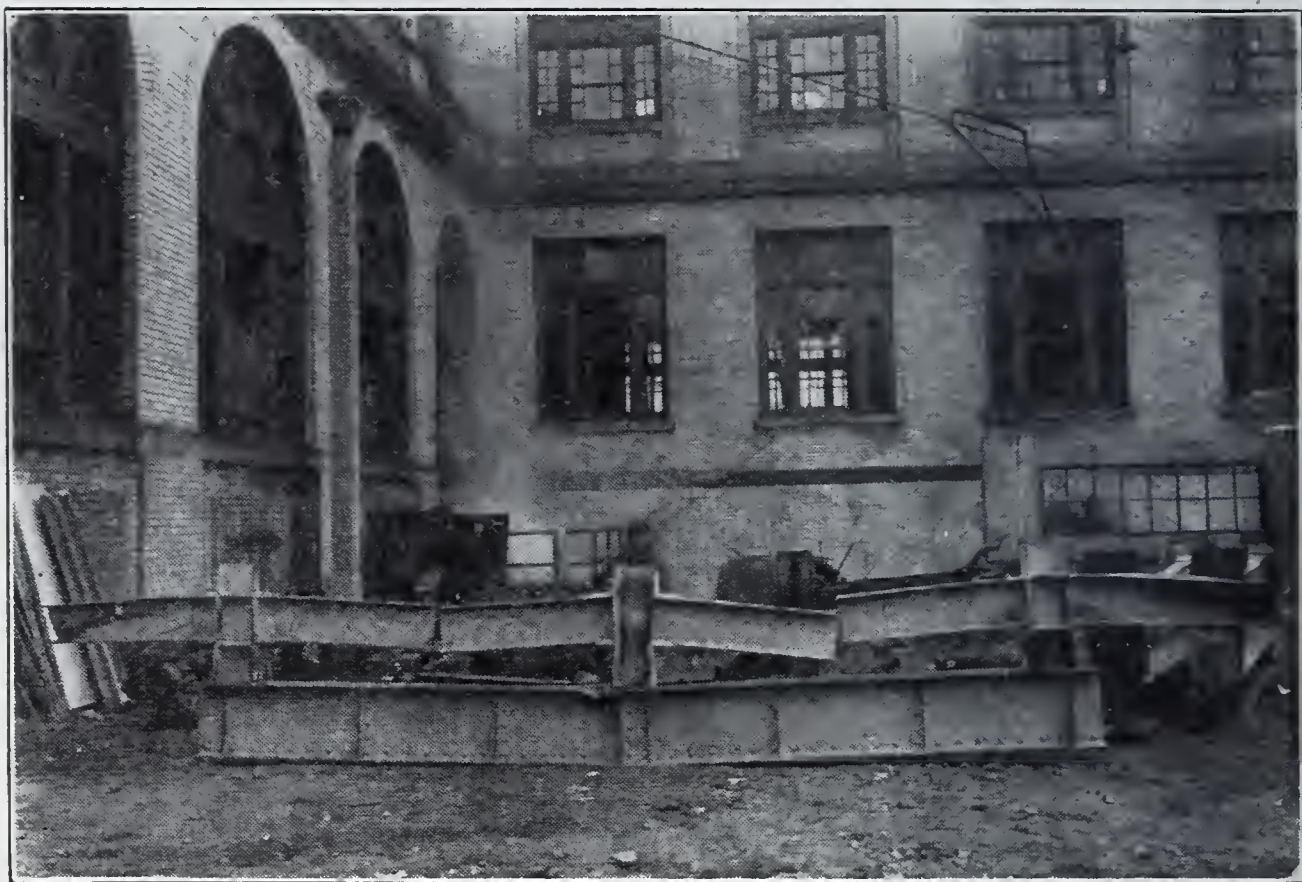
Welded Specimens 2, 4, 3 (Left to Right, Above) and 20.
